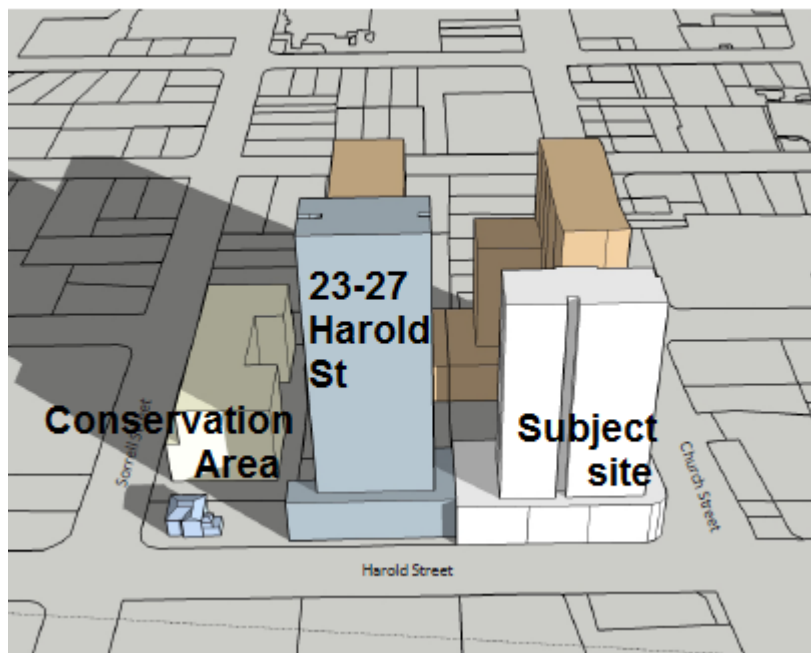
Equitable development (Source: Applicant's Urban Design Report)
